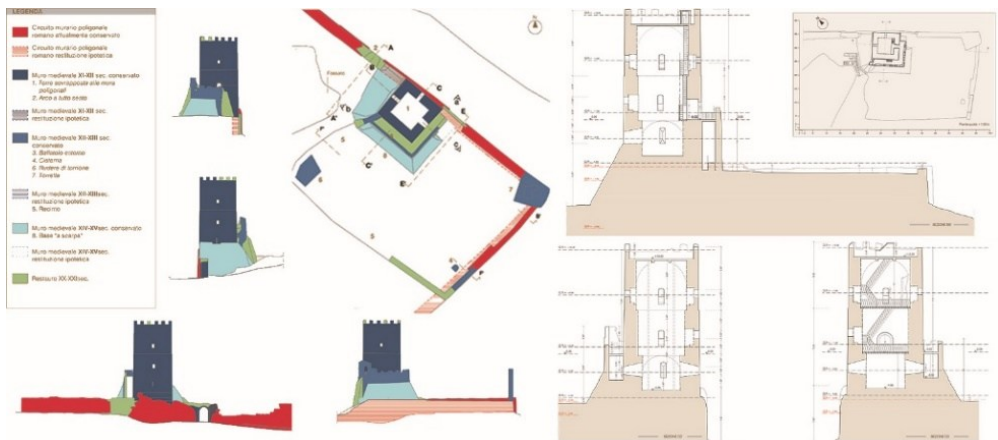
Tower of Cicerone (Arpino)- Front views and layout of the tower and the circle wall; sections cross sections. Reworking (M. Saccucci, 2018) of technical drawings (E. Gemmiti, 2014)
